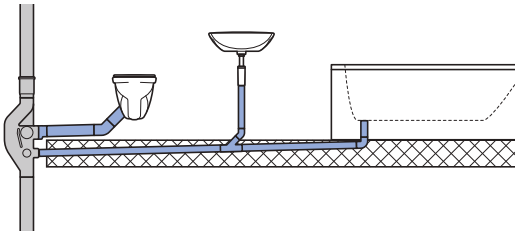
Structure with single branch discharge pipe above the ceiling and collector branch discharge pipe in the ceiling
